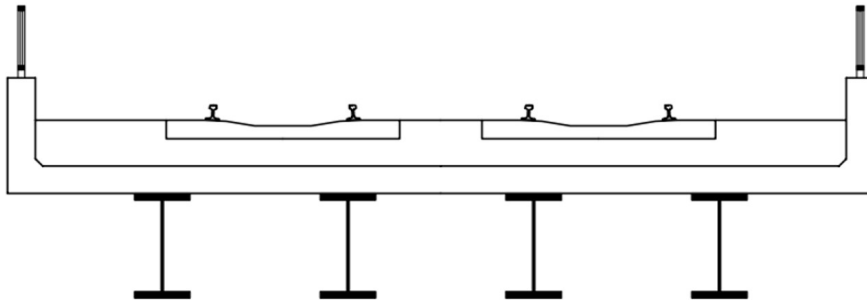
Typical section of a composite bridge with steel I-girders [18].
